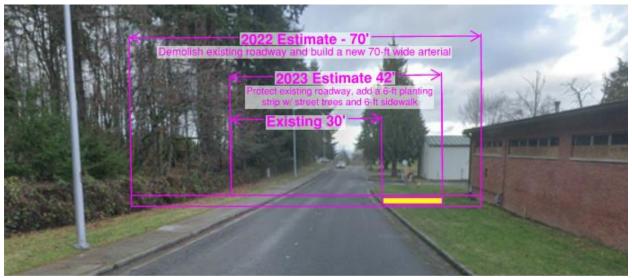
View from south end of middle section of Texas Way facing north (Google Street View)
